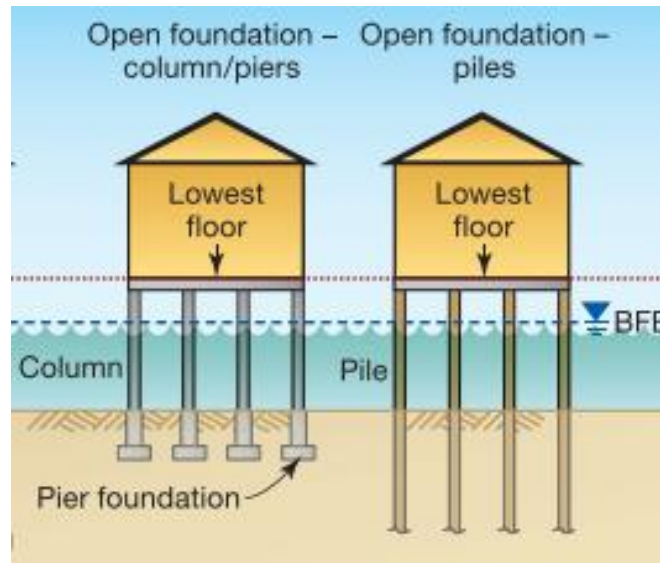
Two types of open foundations: Columns and piles (FEMA)
